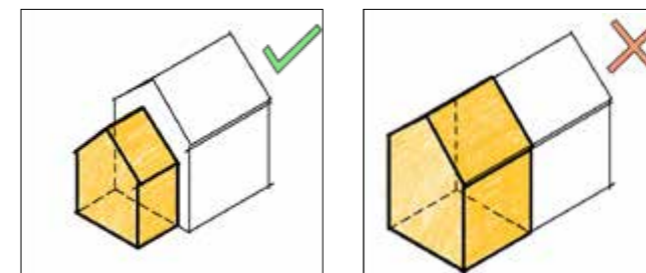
How to ensure that extensions are subservient to the scale and form of the original dwelling
